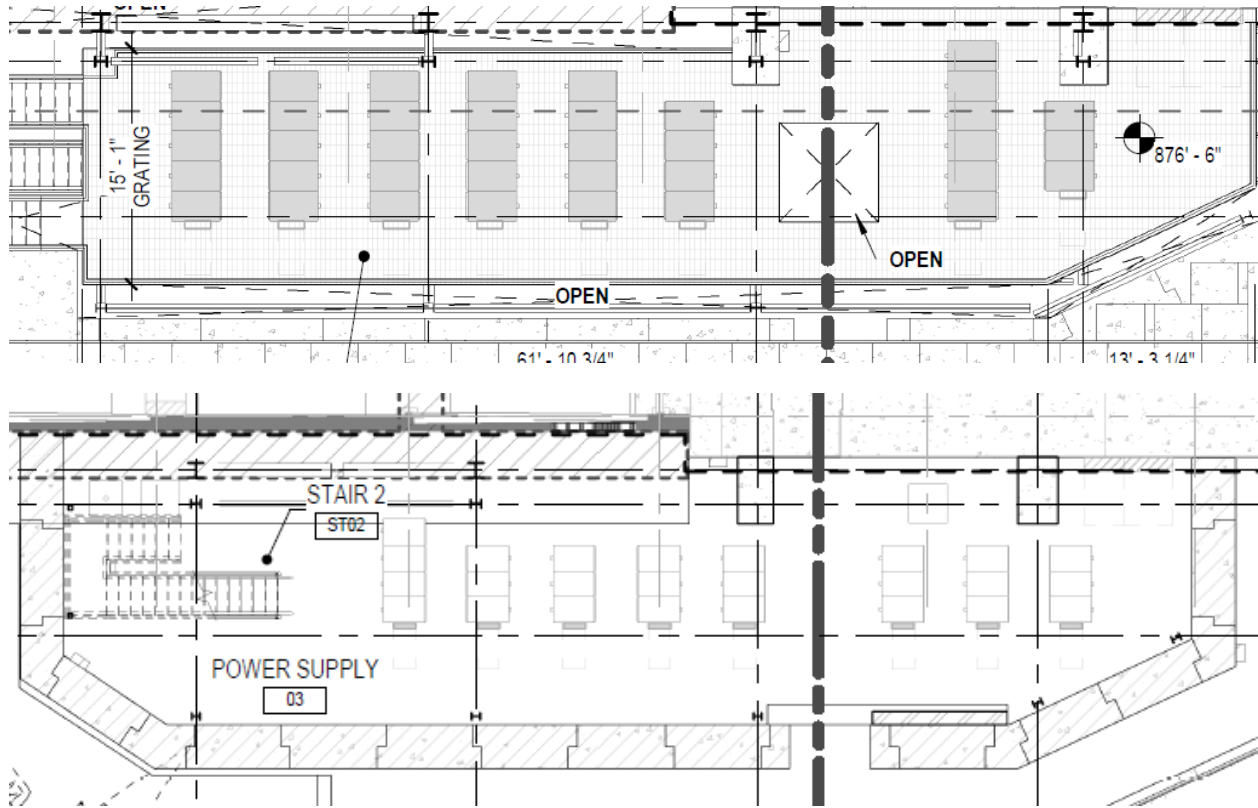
(top) Rack layout at the mezzanine level, providing space for 38 racks. (bottom) Rack layout at the ground floor level, providing space for 25 racks.
